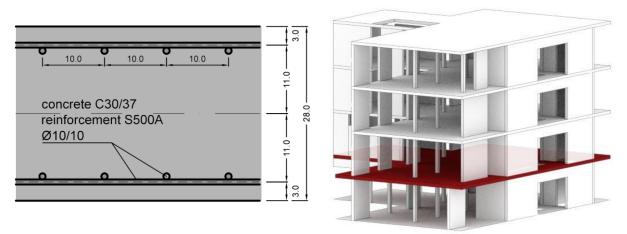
Slab 28cm, section with reinforcement and location of this slab in the building
